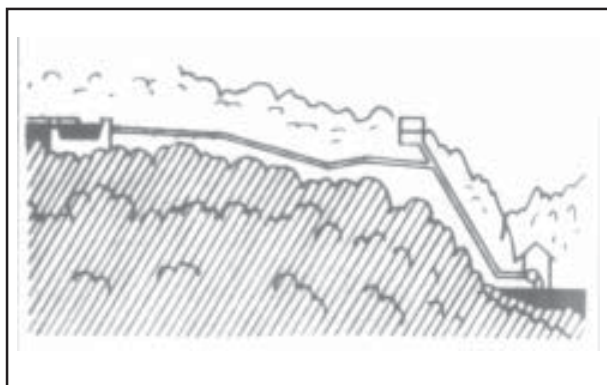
Typical Layout for Small-Scale Hydropower Plants in Mountain Regions.
